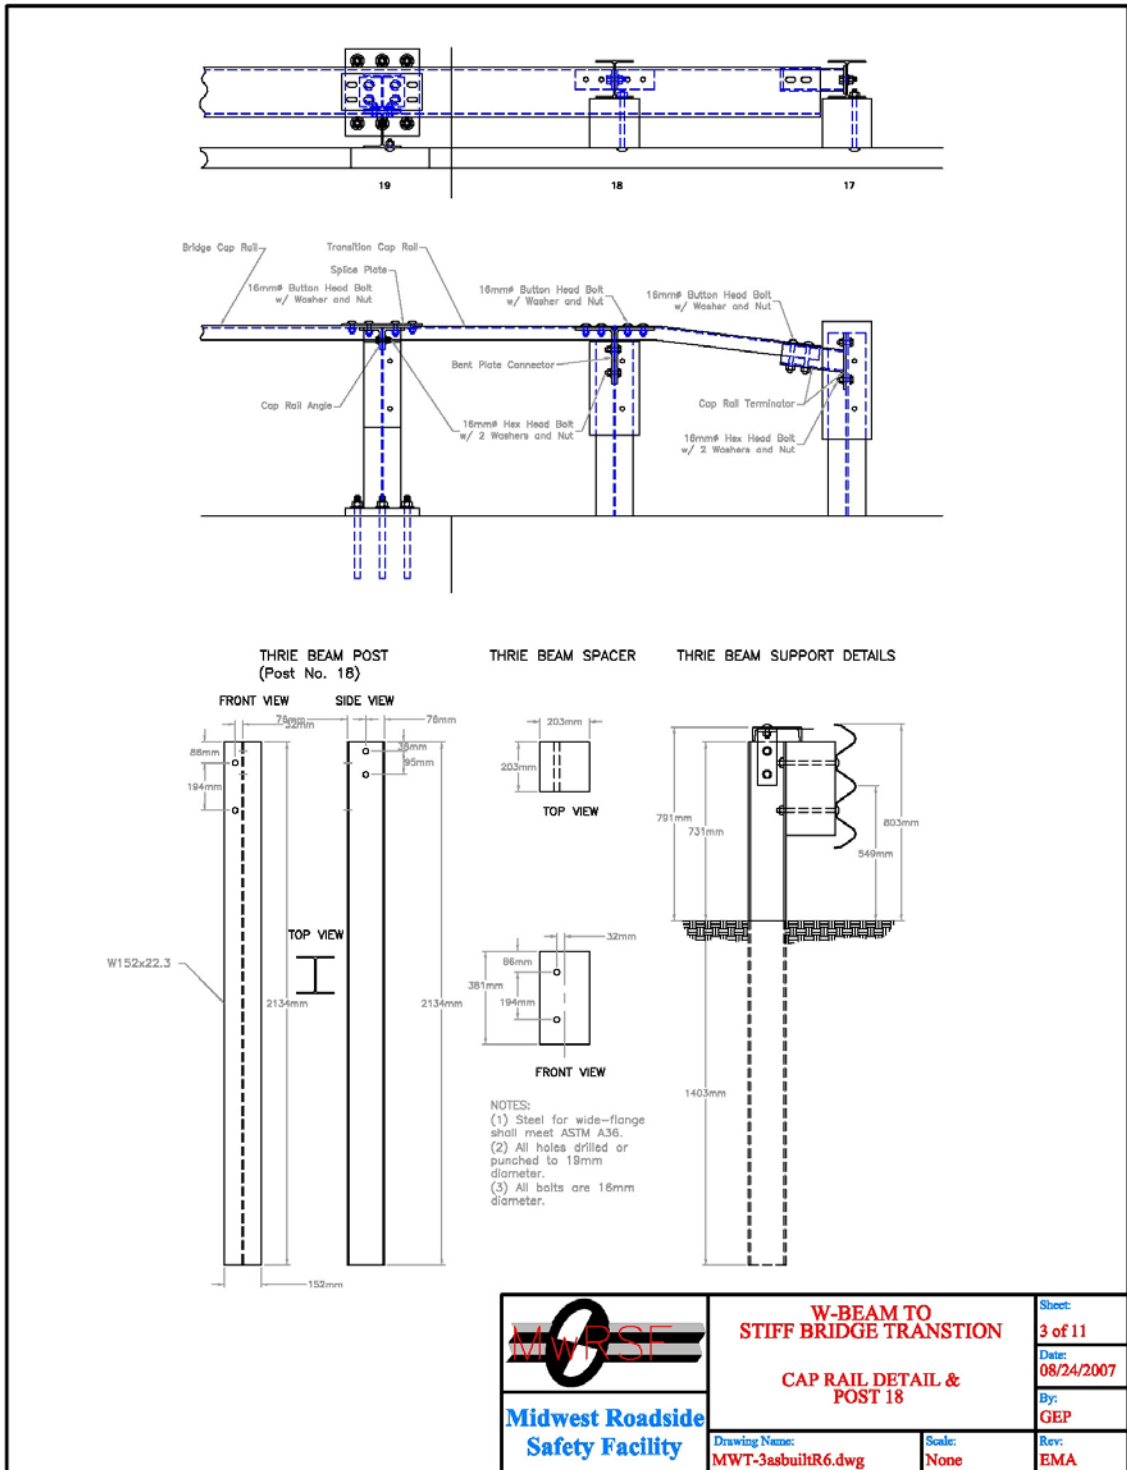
Cap Rail and Post No. 18 Details (Design No. 1)
